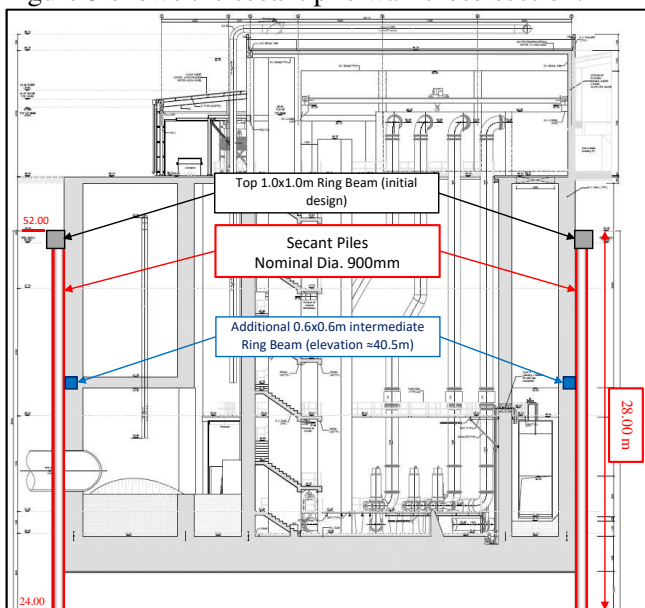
Section drawing of the secant pile wall and Inlet Pumping Station
